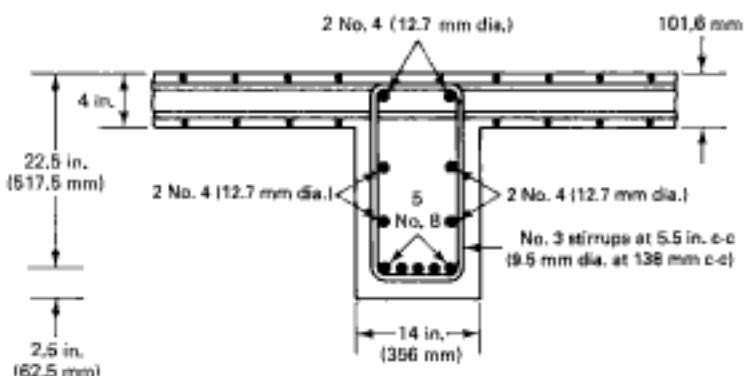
Web reinforcement details, Ex. 7.1(c).
